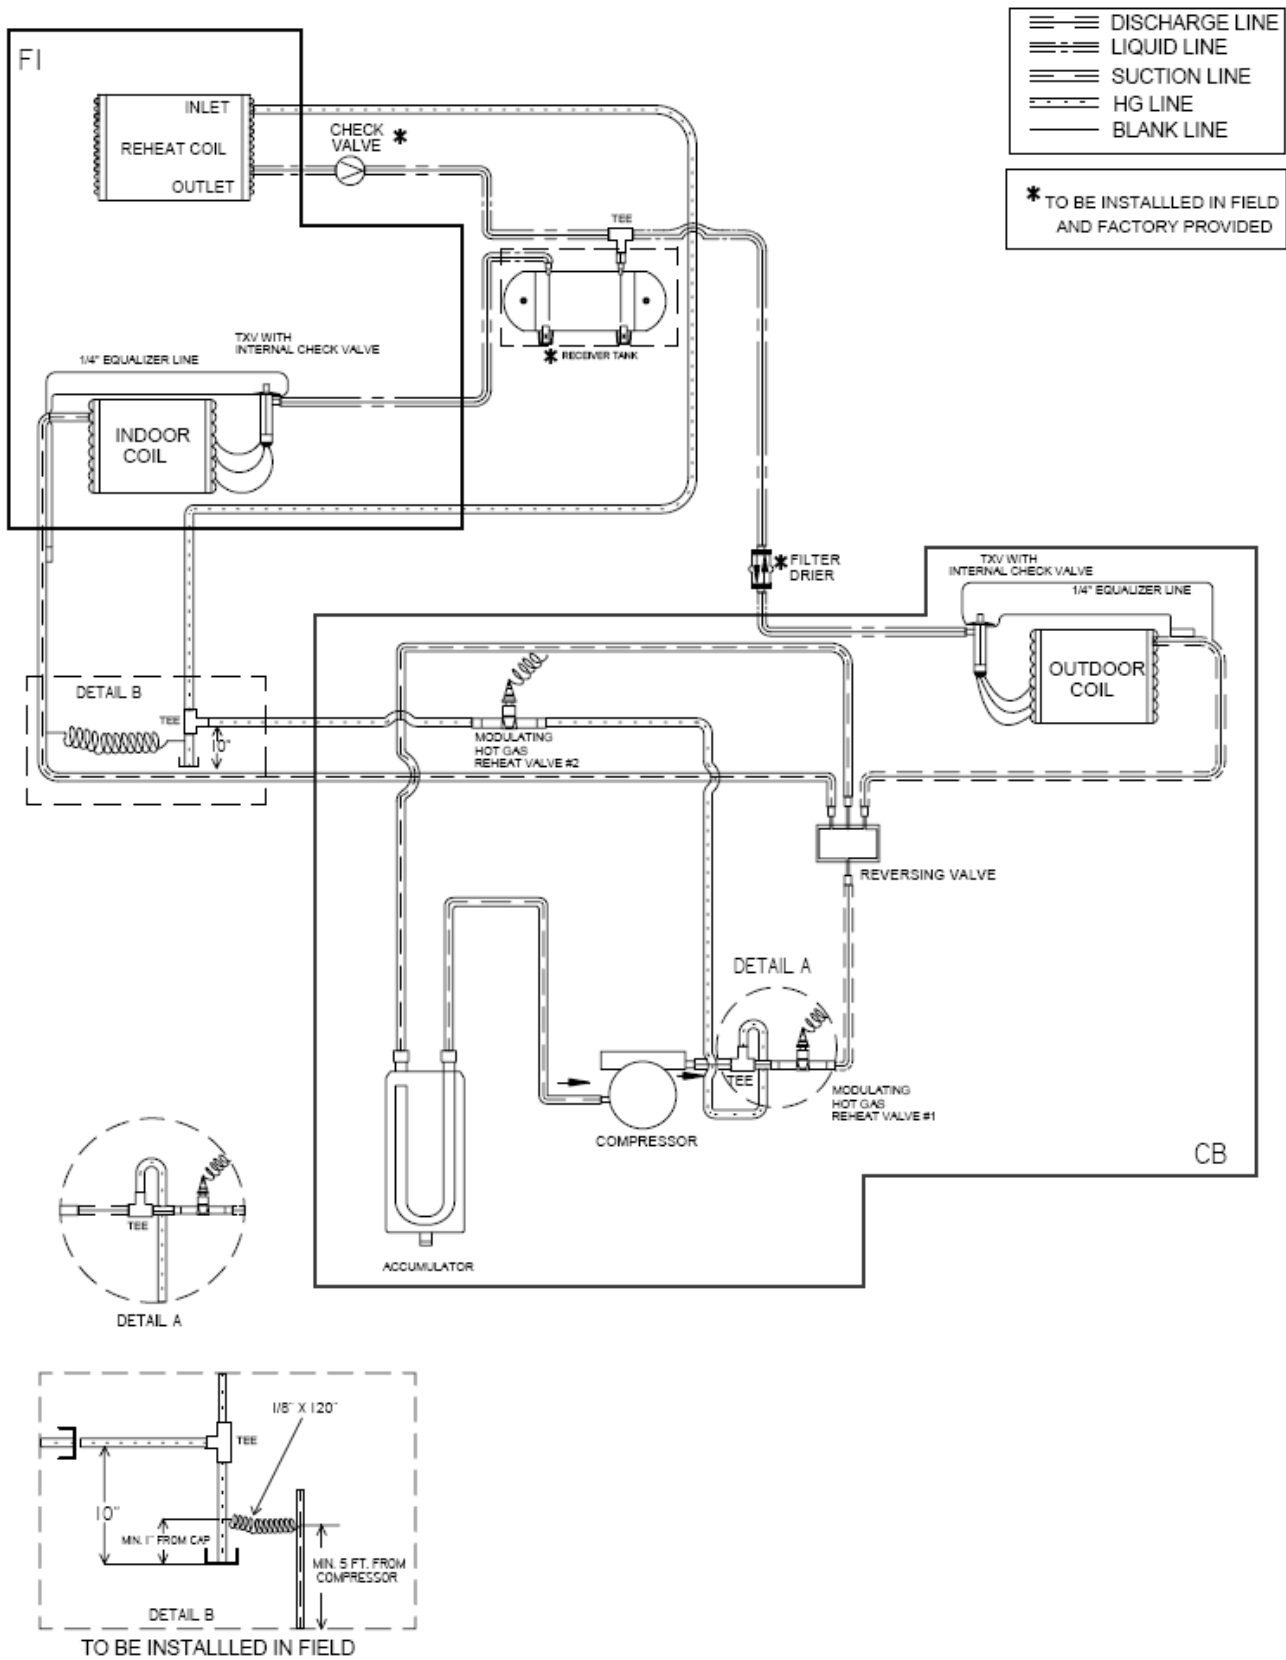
HEAT PUMP PIPING WITH REHEAT & INDOOR UNIT ABOVE OUTDOOR UNIT
